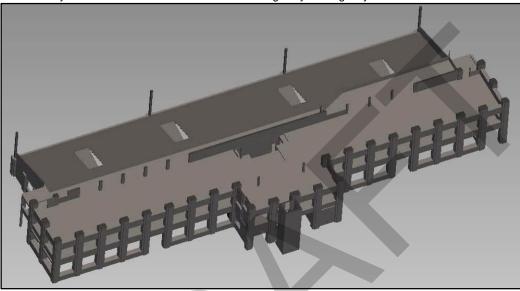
Cutaway showing walls and columns at the second floor level at GNS
